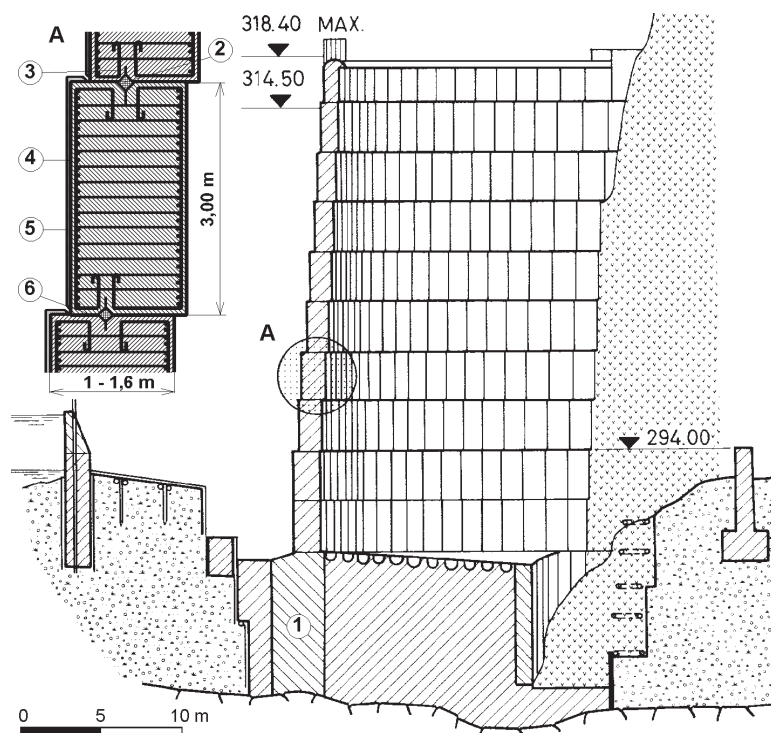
Cross-section of the Matka dam, along with a detail of the joint between arches (A). (1) Concrete foundation; (2) clay filling; (3) waterstop of copper sheet; (4) insulation of bituminous coating; (5) protective layer of reinforced mortar; (6) insulation coating and a thin zinc sheet.
